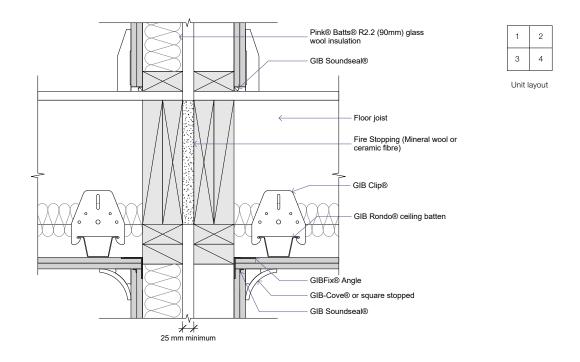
Typical IT double timber frame wall and floor/ceiling junction
